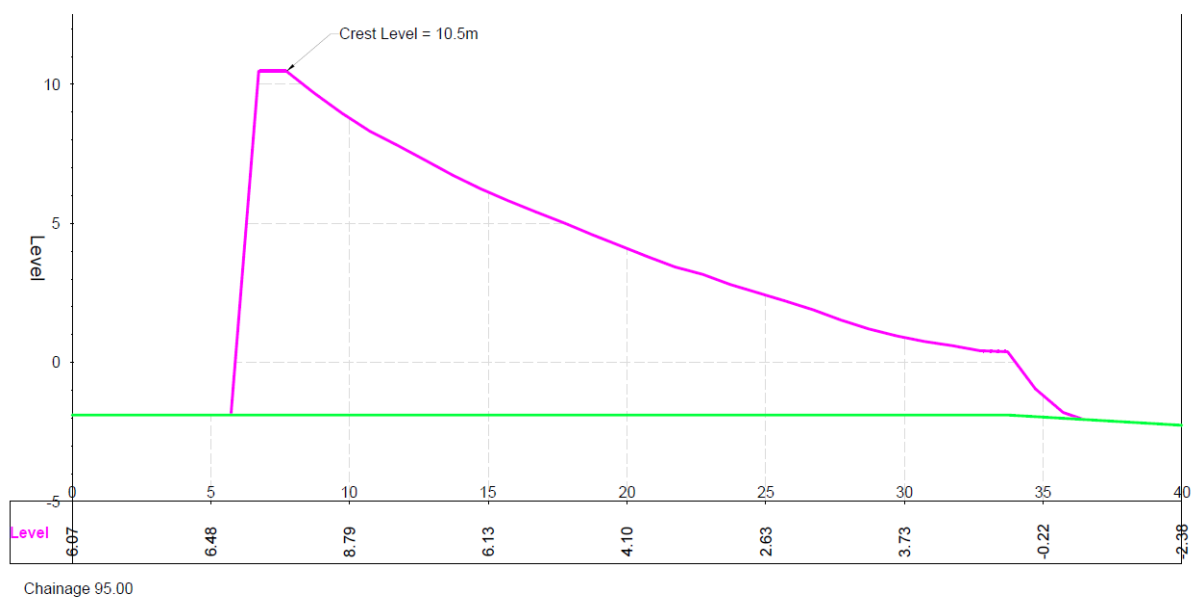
Section profile for the South-Easterly revetment section of the existing breakwater
